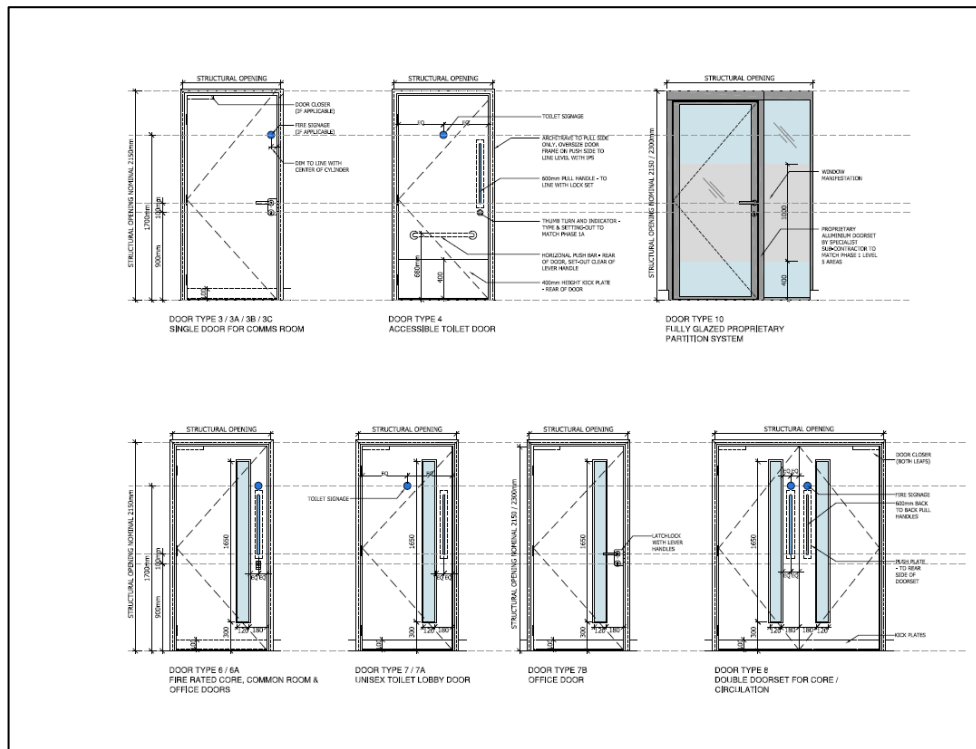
Proposed Door Types (Source: Architon LLP, drawing ref. 3147-WS2-2072 P2)
